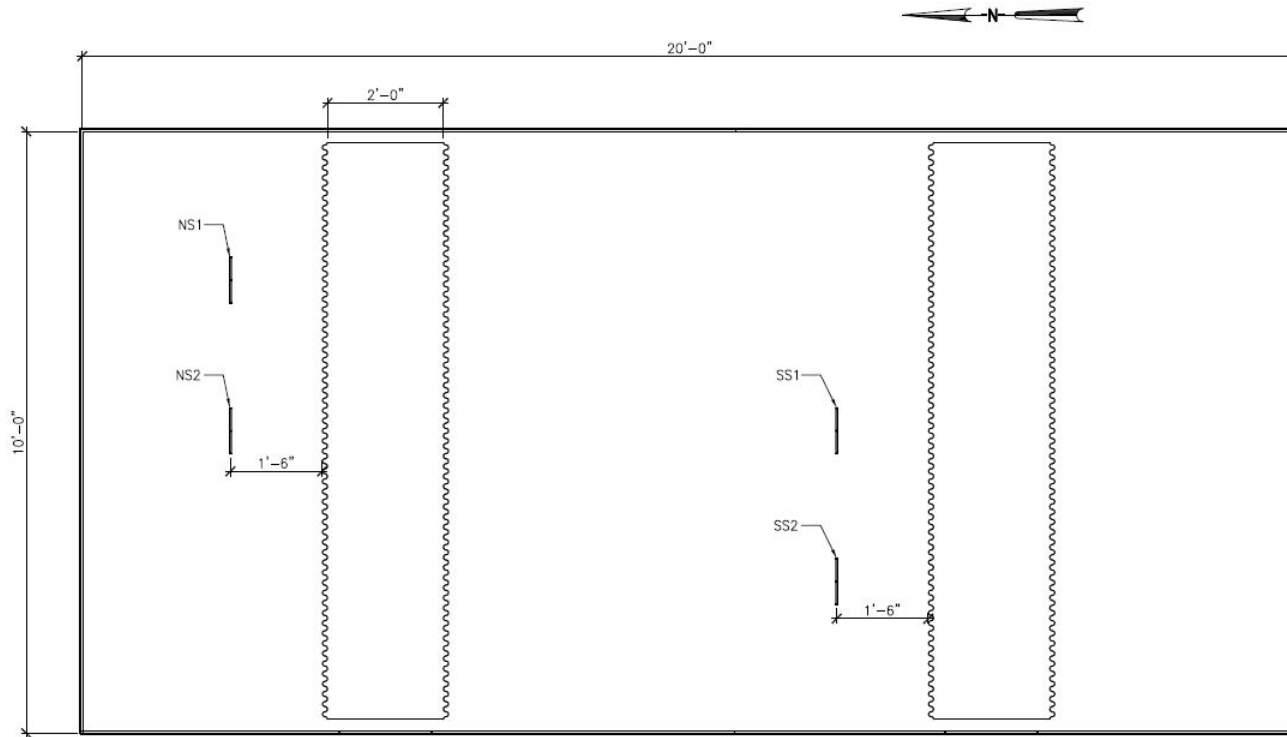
Earth pressure cell layout through Section F-F for 24 inch HDPE pipe test
